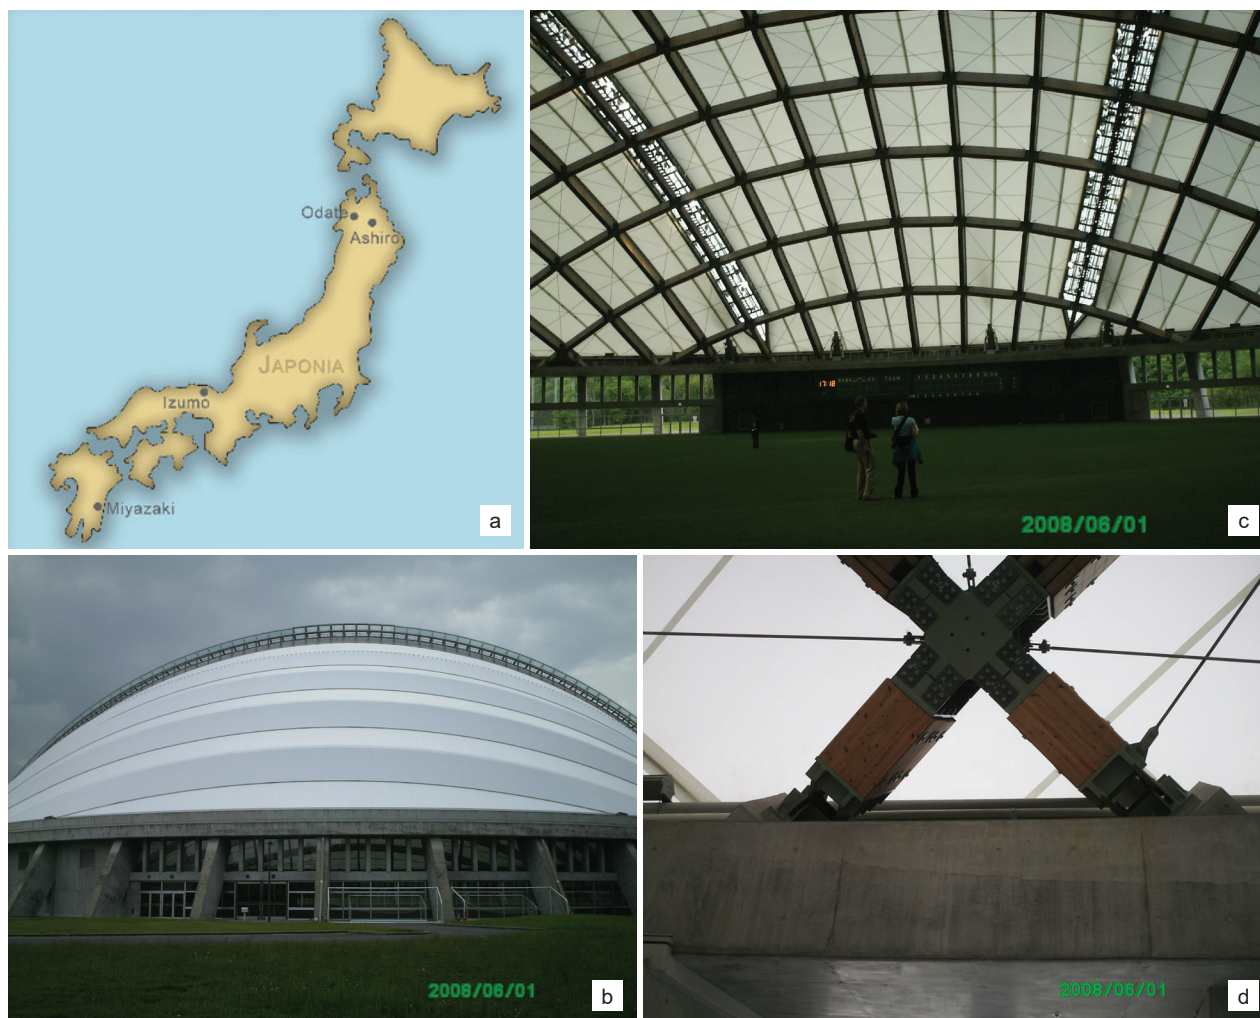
Beam scaffolding, steel-wood Konohana Dome built with sugi wood in Miyazaki, Japan, 2004:
